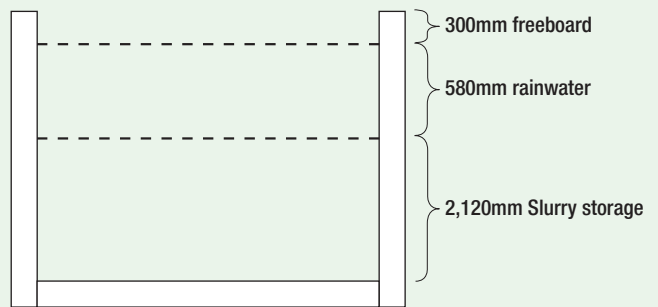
Outdoor tank 3.0m high showing freeboard, rainwater and slurry storage for 18-week zone with 32mm rain per week (not to scale)
